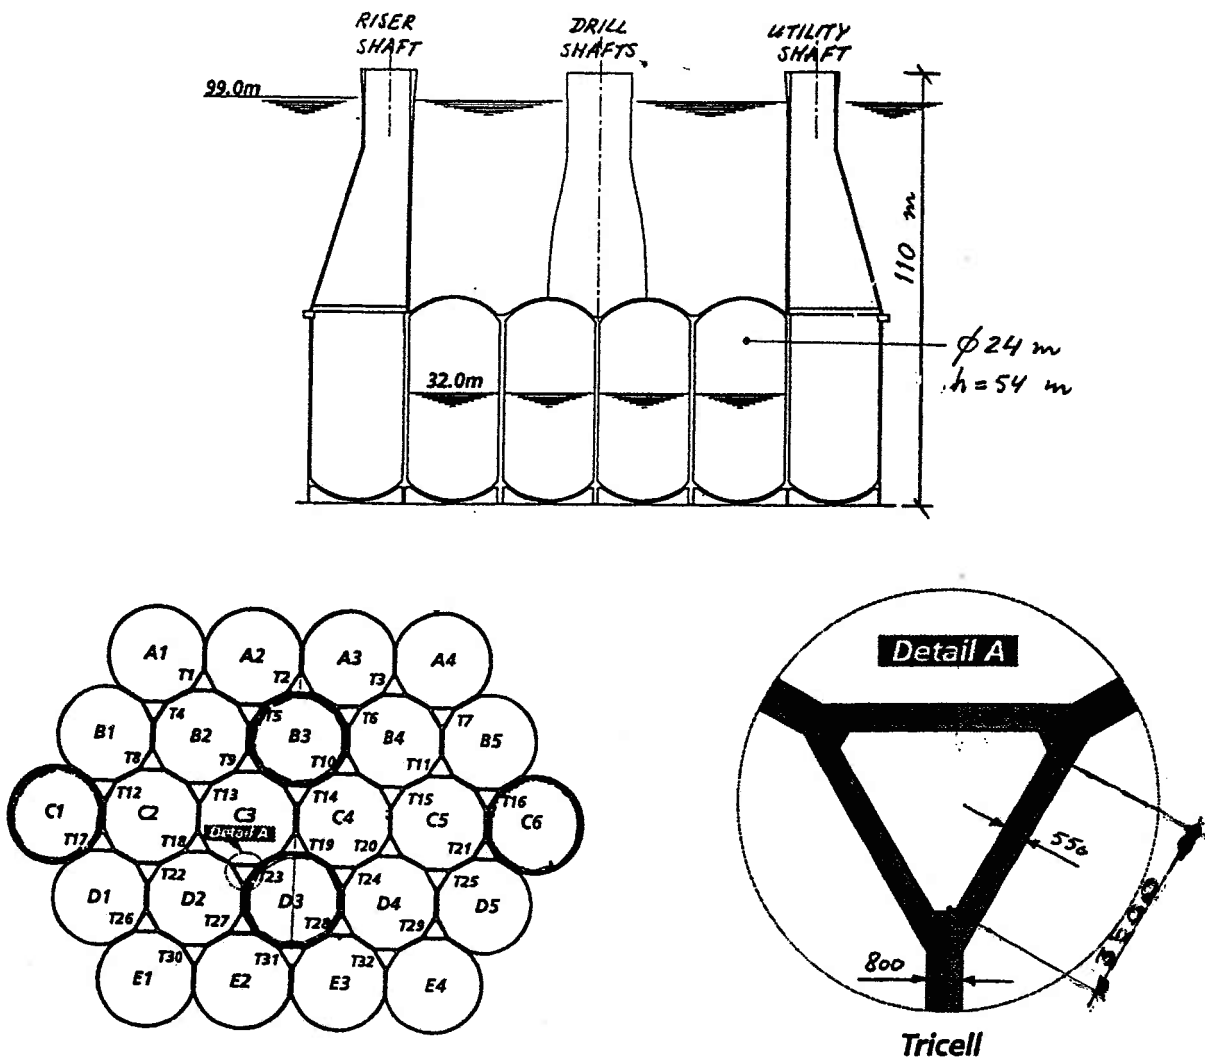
Vertical and horizontal cross sections and detail of the Sleipner GBS
